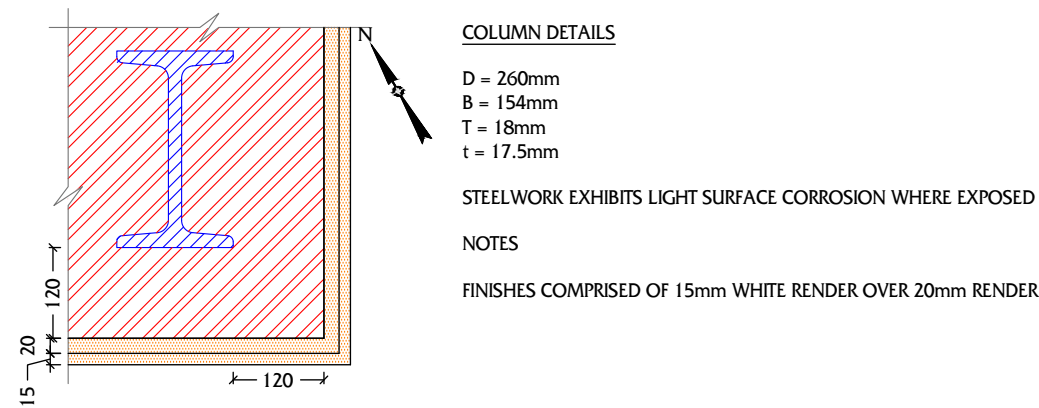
PART PLAN SHOWING DETAILS OF COLUMN A12 SCALE 1:10
